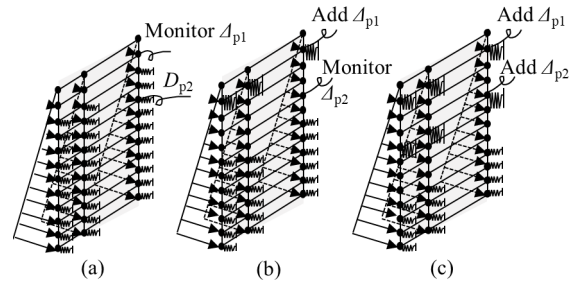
Excavation simulation process: (a) First step of excavation; (b) Installing the first layer of struts and second step of excavation; (c) Installing the second layer of struts and third step of excavation.
